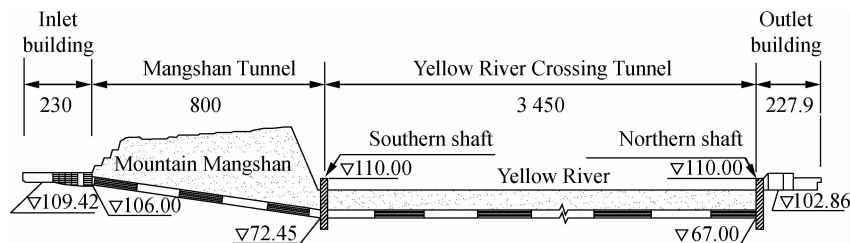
Longitudinal profile of the Yellow River Crossing Project (unit: m)
